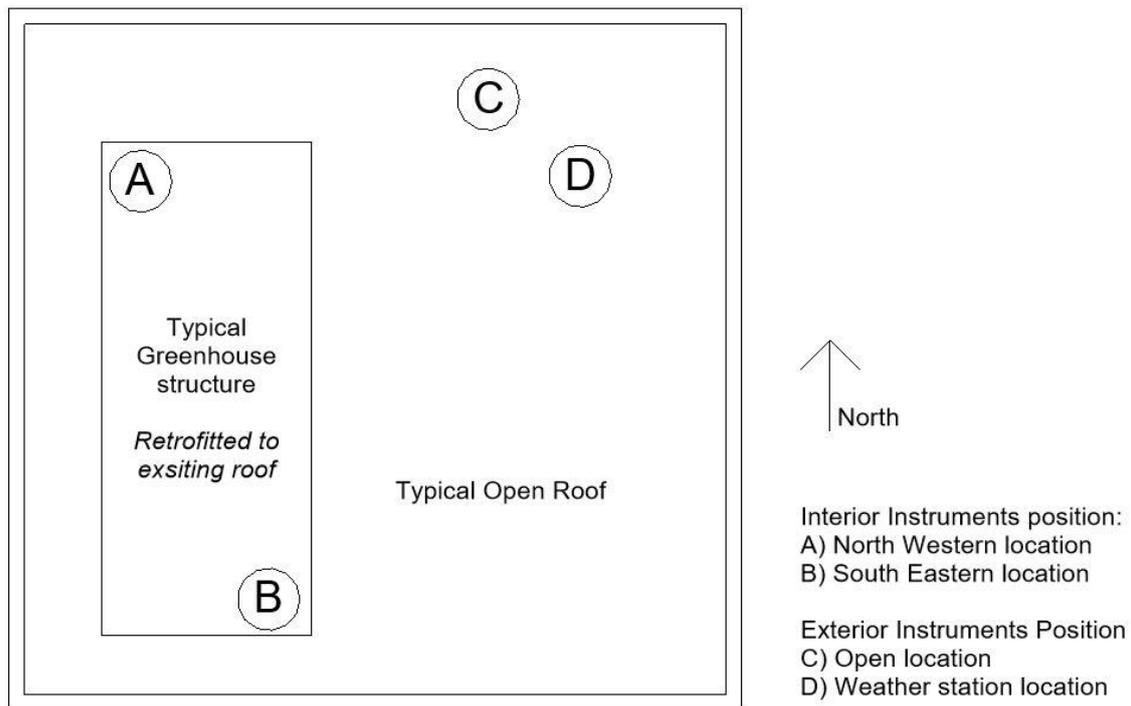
Layout and measurement locations of a typical rooftop greenhouse documented during the study.
